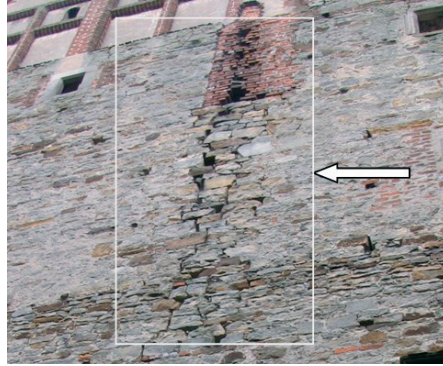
Damage to the masonry structure /castle in Drzewica/
